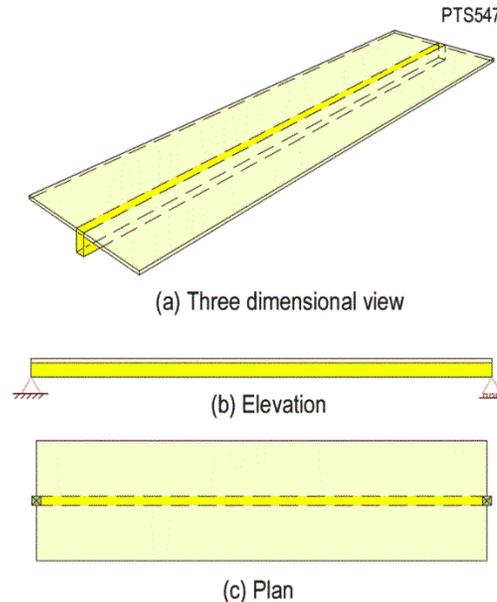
Simply Supported Flanged Beam under Uniform Loading
